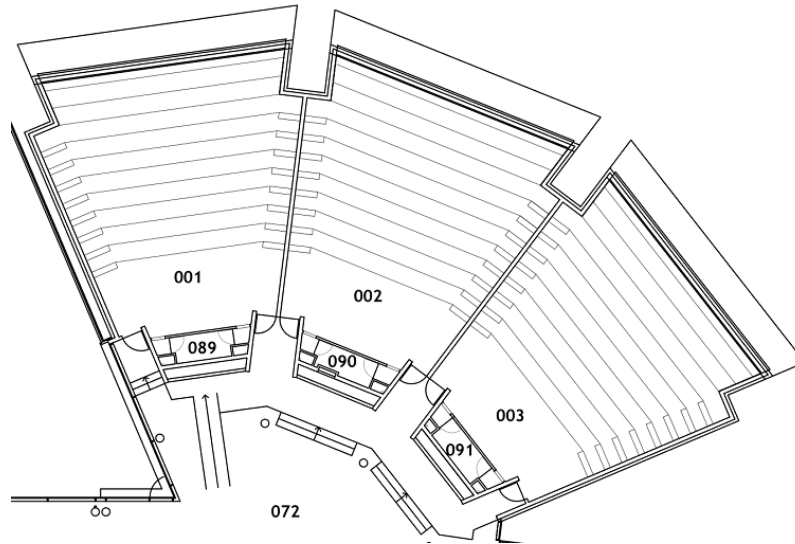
Auditoriums Ground floor layout [extracted from FEUP (n.d.)]
